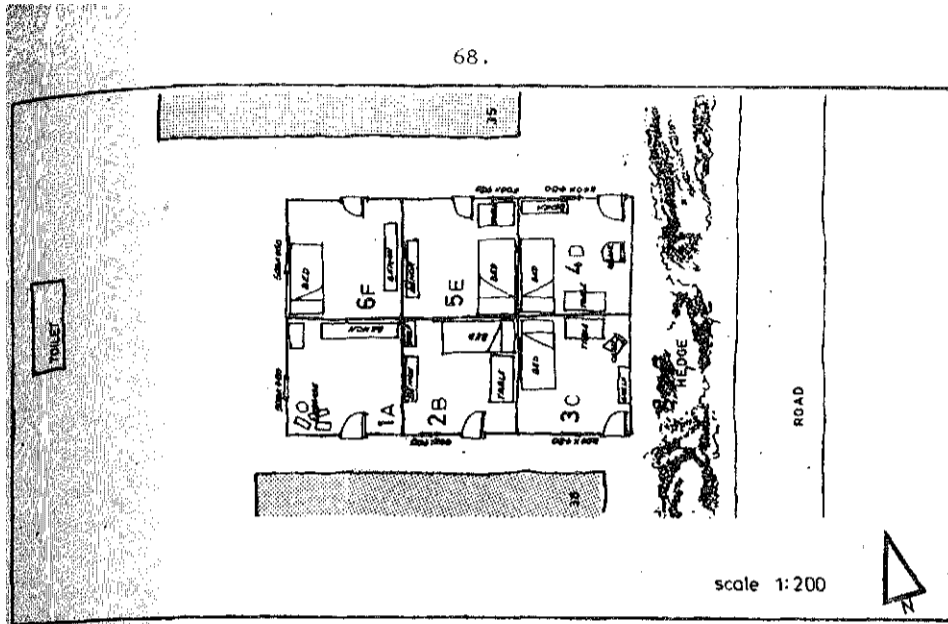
COMPACT DWELLING WITH EXTERNAL DOOR ACCESS
